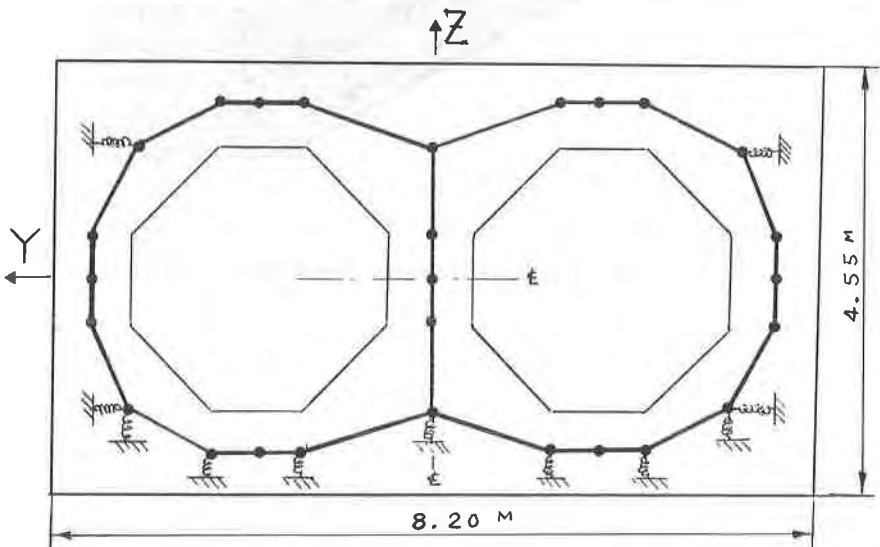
TYPICAL CROSS-SECTION SHOWING THE LOCATIONS OF SOIL SPRINGS FOR THE TUNNEL IN FIGURE 1 (EXAMPLE 1)
